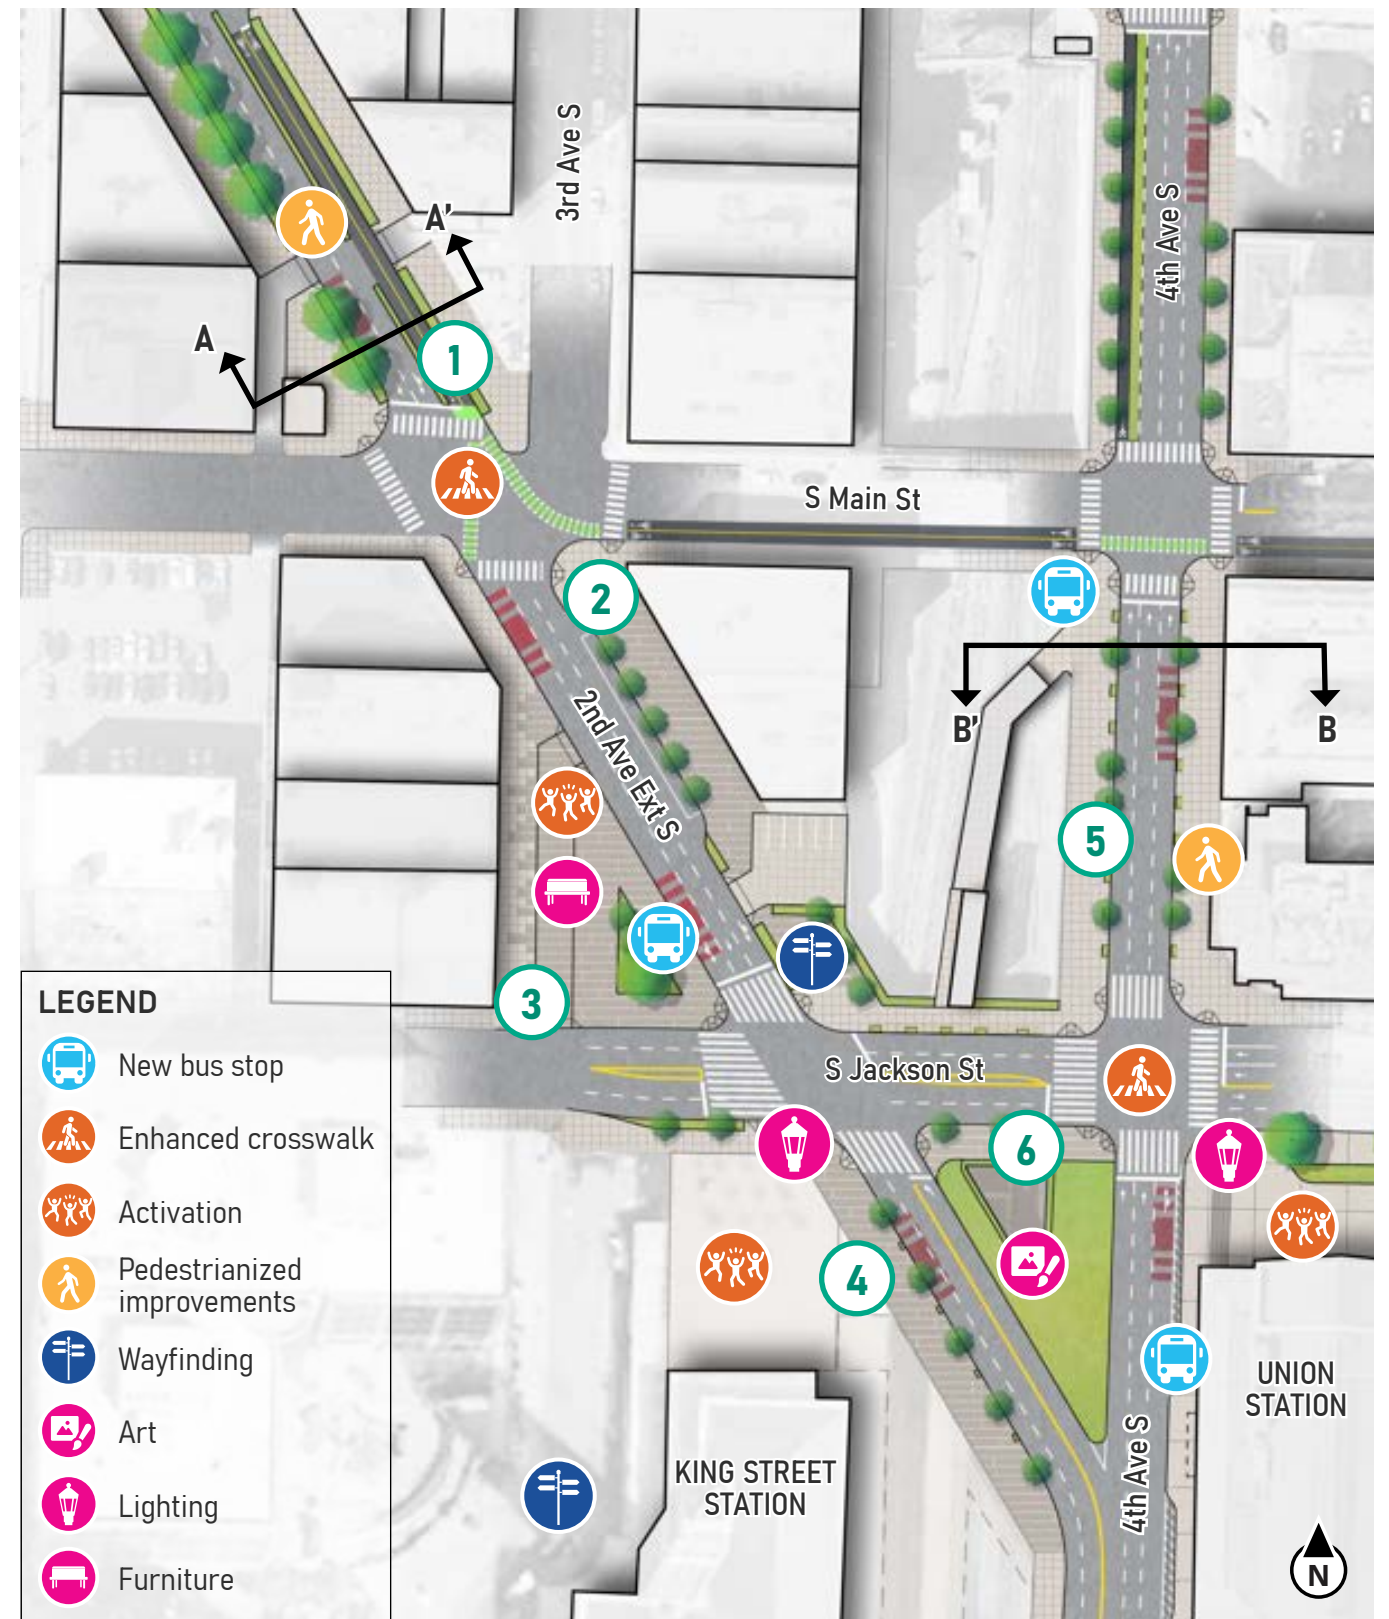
Stitch Focus Area Enlarged Plan. Plan view showing potential improvements. Note: Details of design and implementation subject to ongoing coordination with 2nd Ave Ext S and S Jackson St Bridge Study and King Street Access Improvements.
